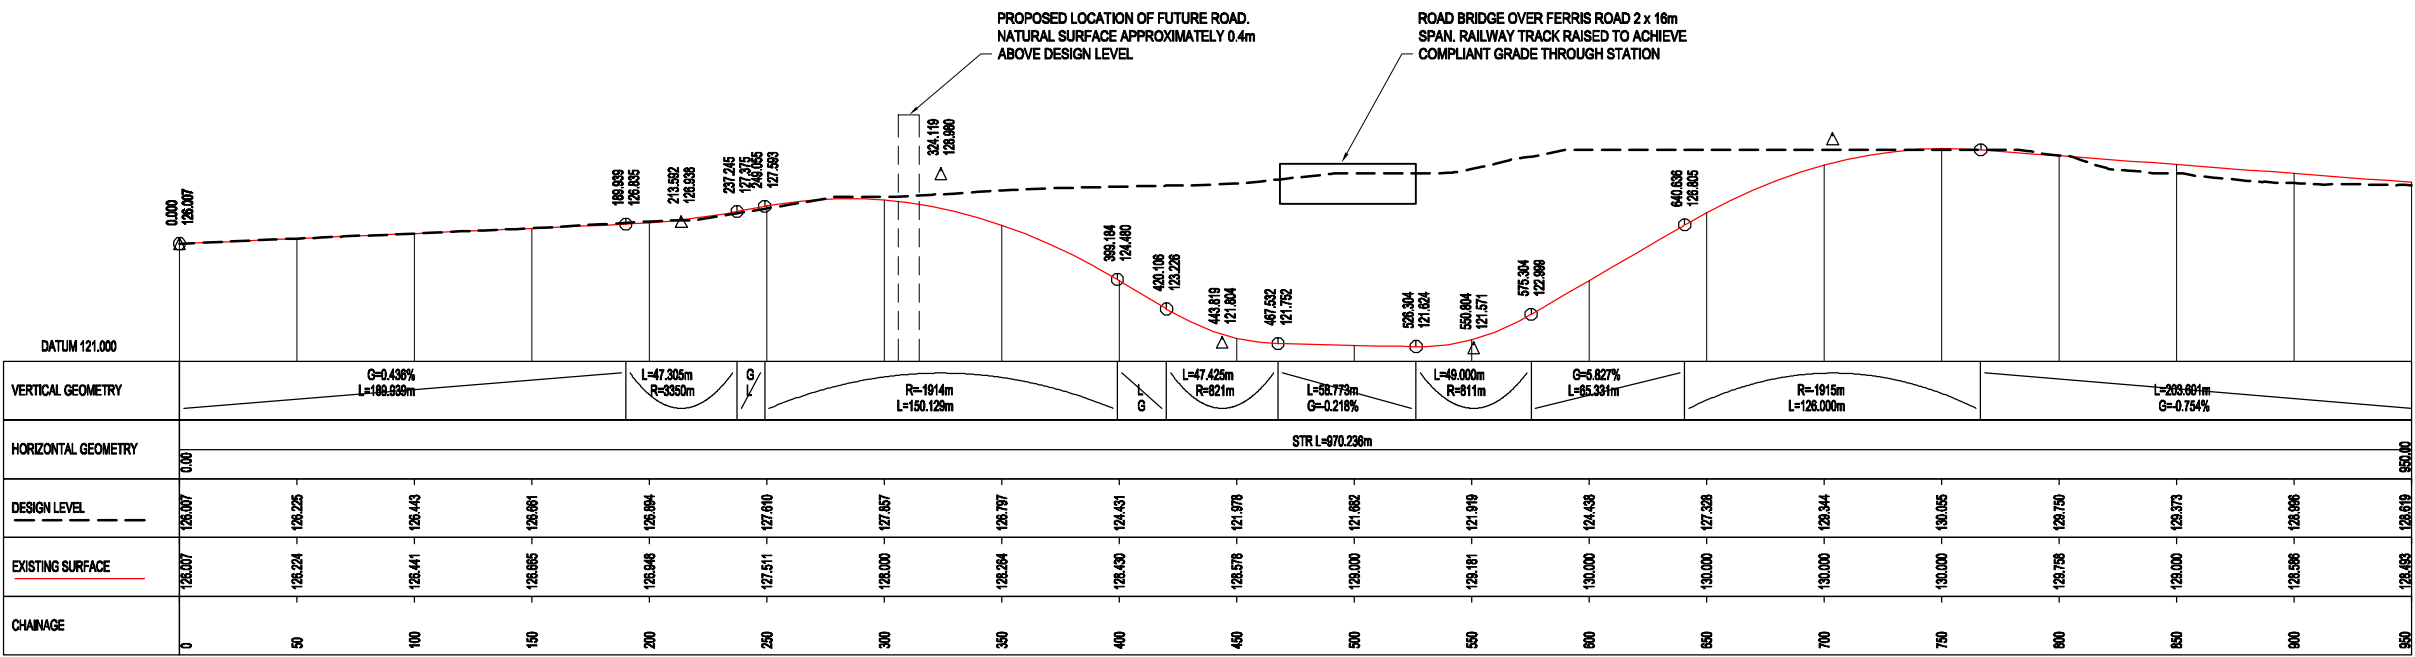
Ferris Road Underpass Long Section - Rail Option 2
